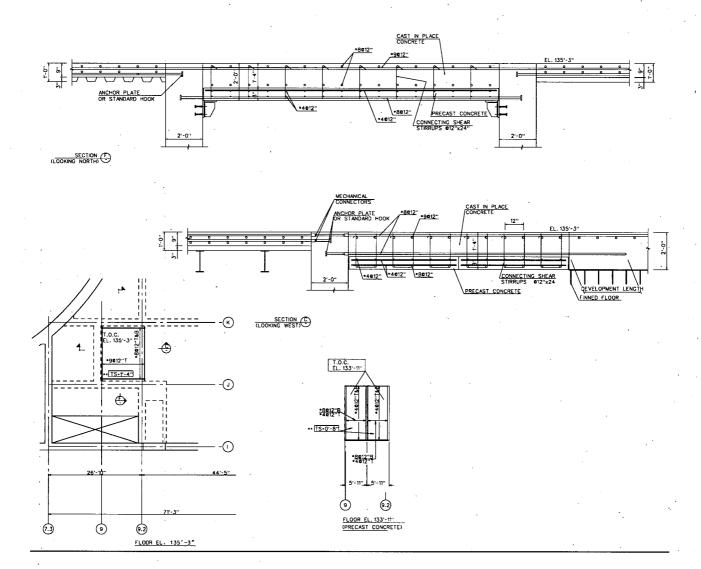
Typical Reinforcement and Connection to Shield Building
